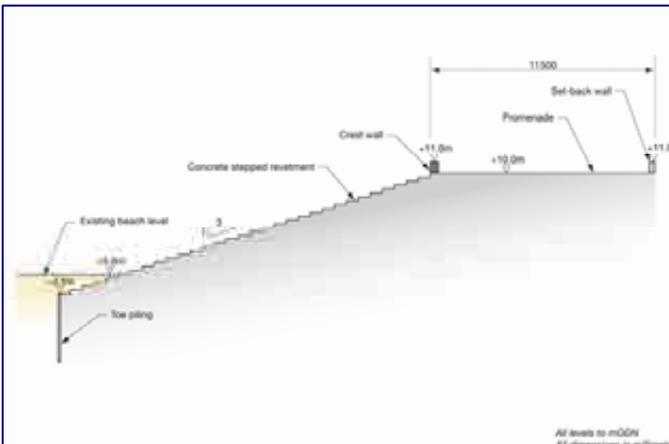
Sandy Bay cross section 1 - stepped concrete revetment and promenade
